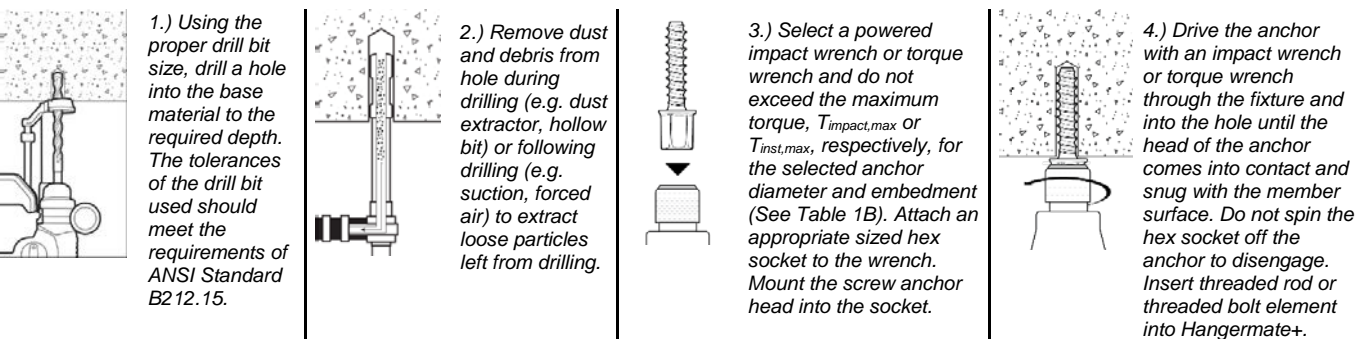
HANGERMATE+ INSTALLATION INSTRUCTIONS (Internally Threaded Rod Hanger Version Illustrated, External Thread Hanger Not Shown)
